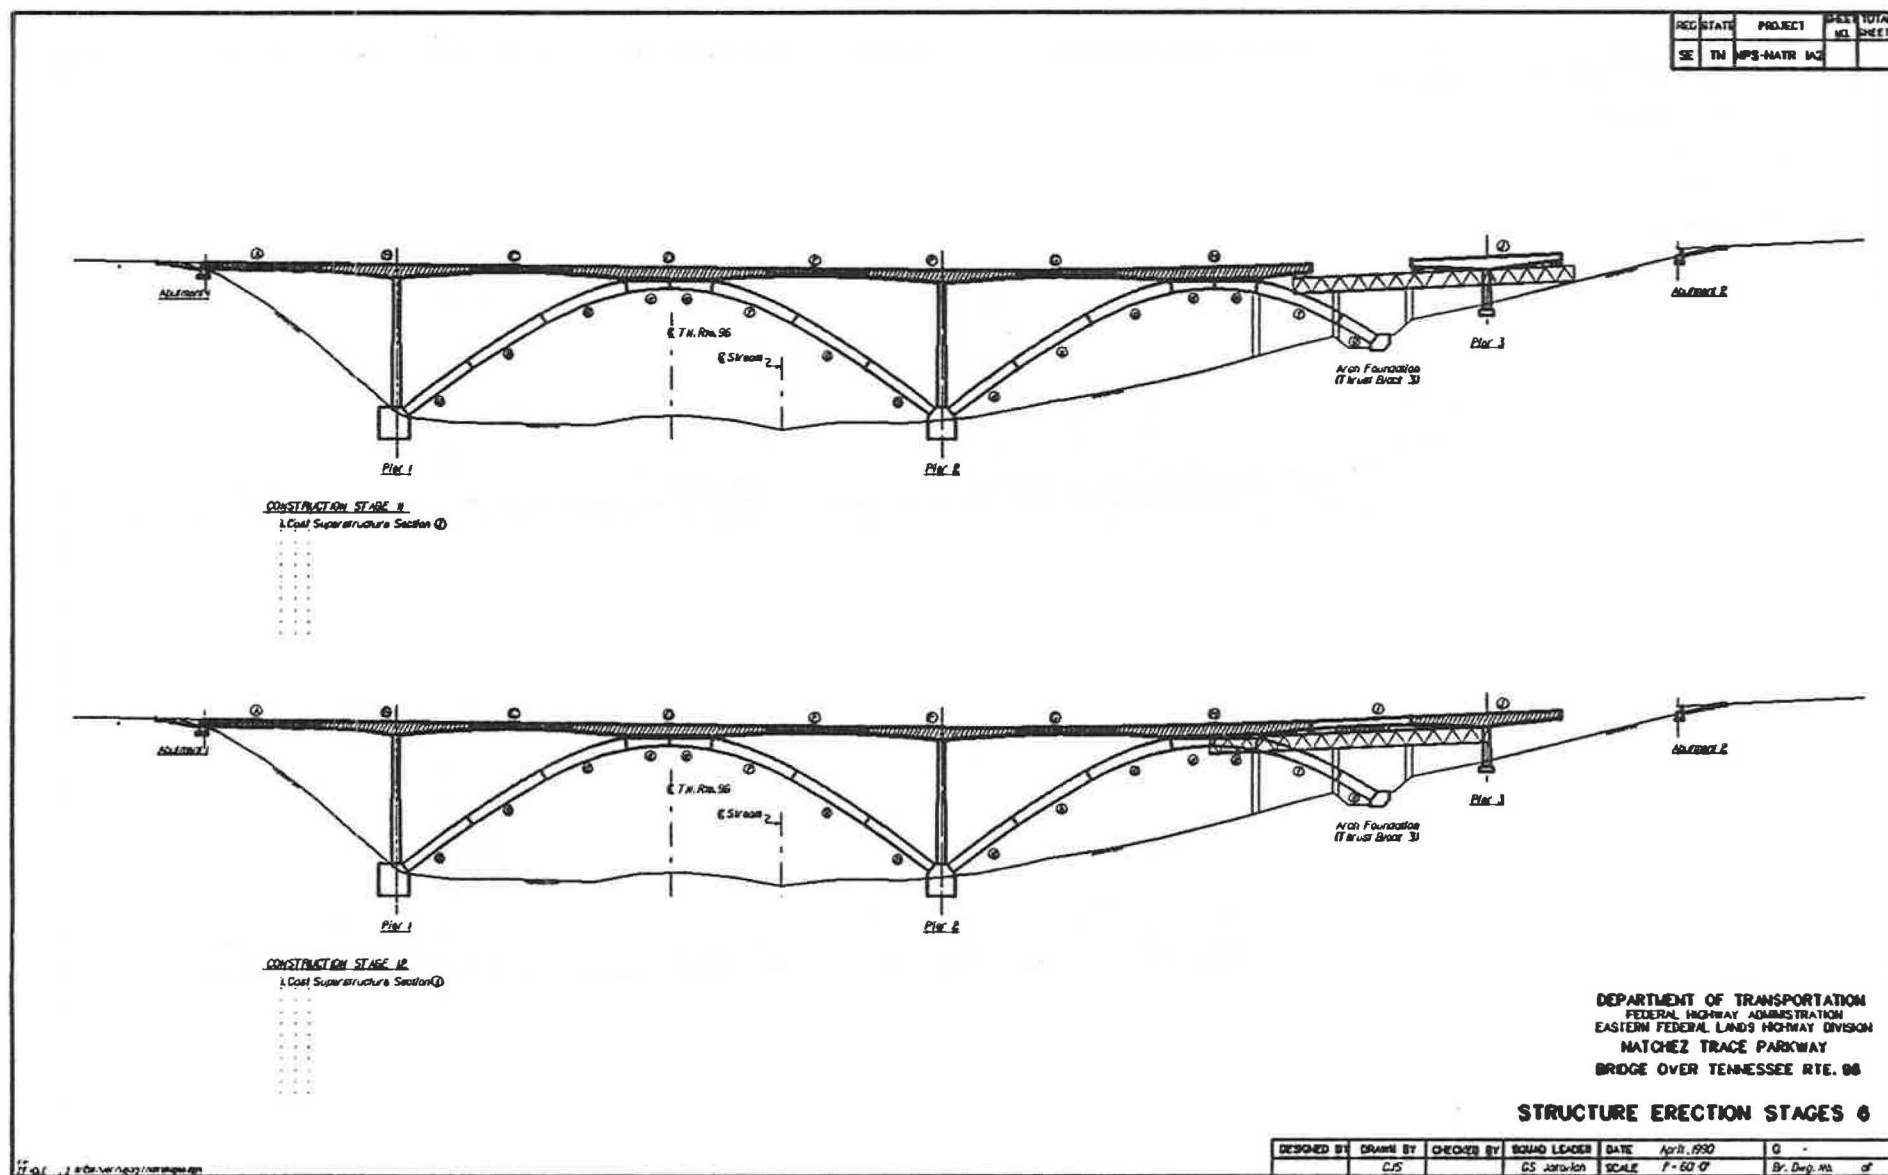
Construction stages 11 and 12 showing pier 3 cantilever and span 7 closure placement
